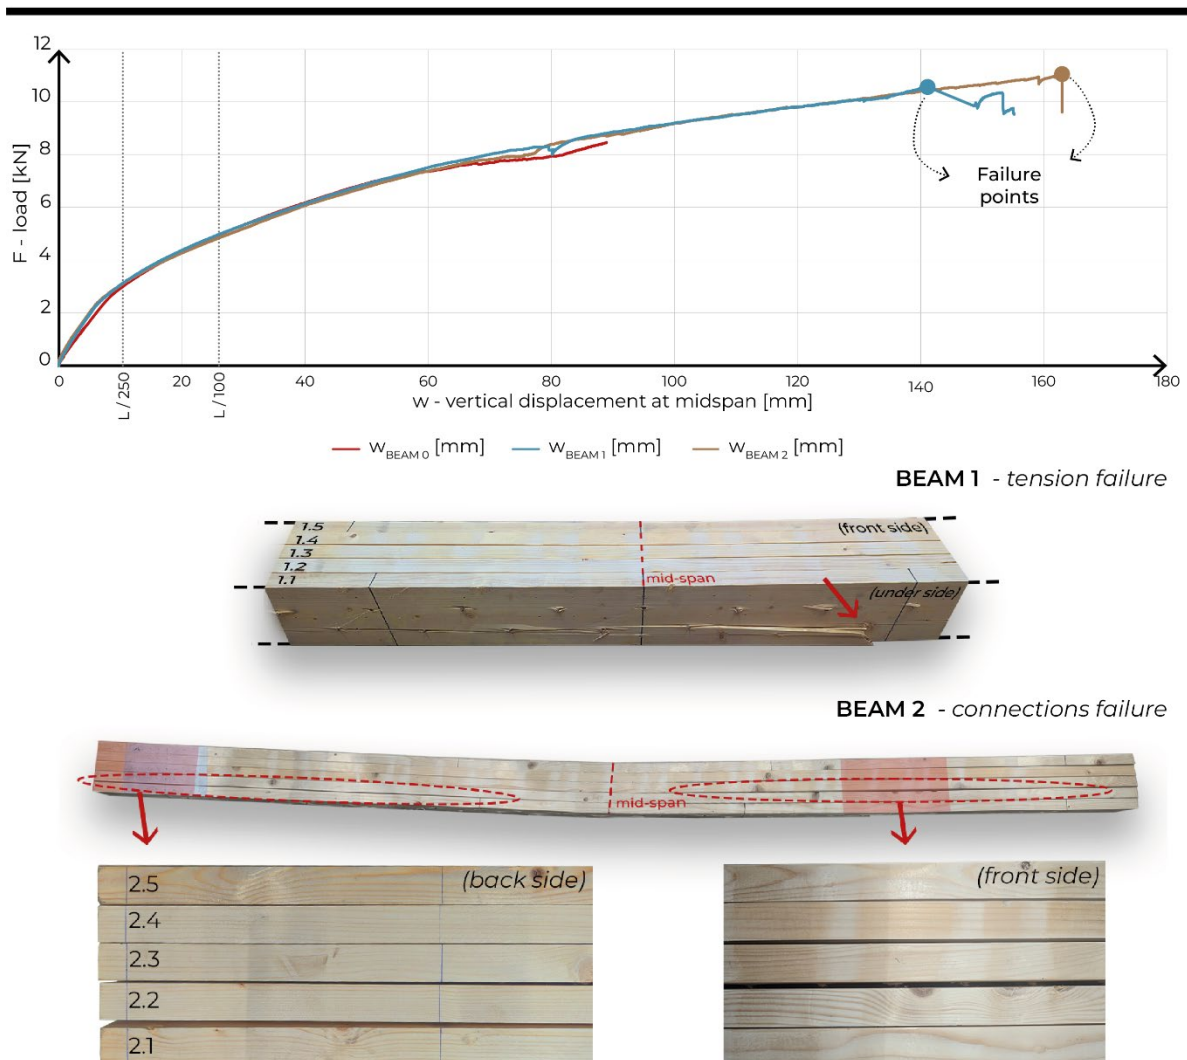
Load-slip curves for all beam specimens tested (BEAM 0, BEAM 1 and BEAM 2) and corresponding failure modes. BEAM 0 was not loaded to complete failure.
